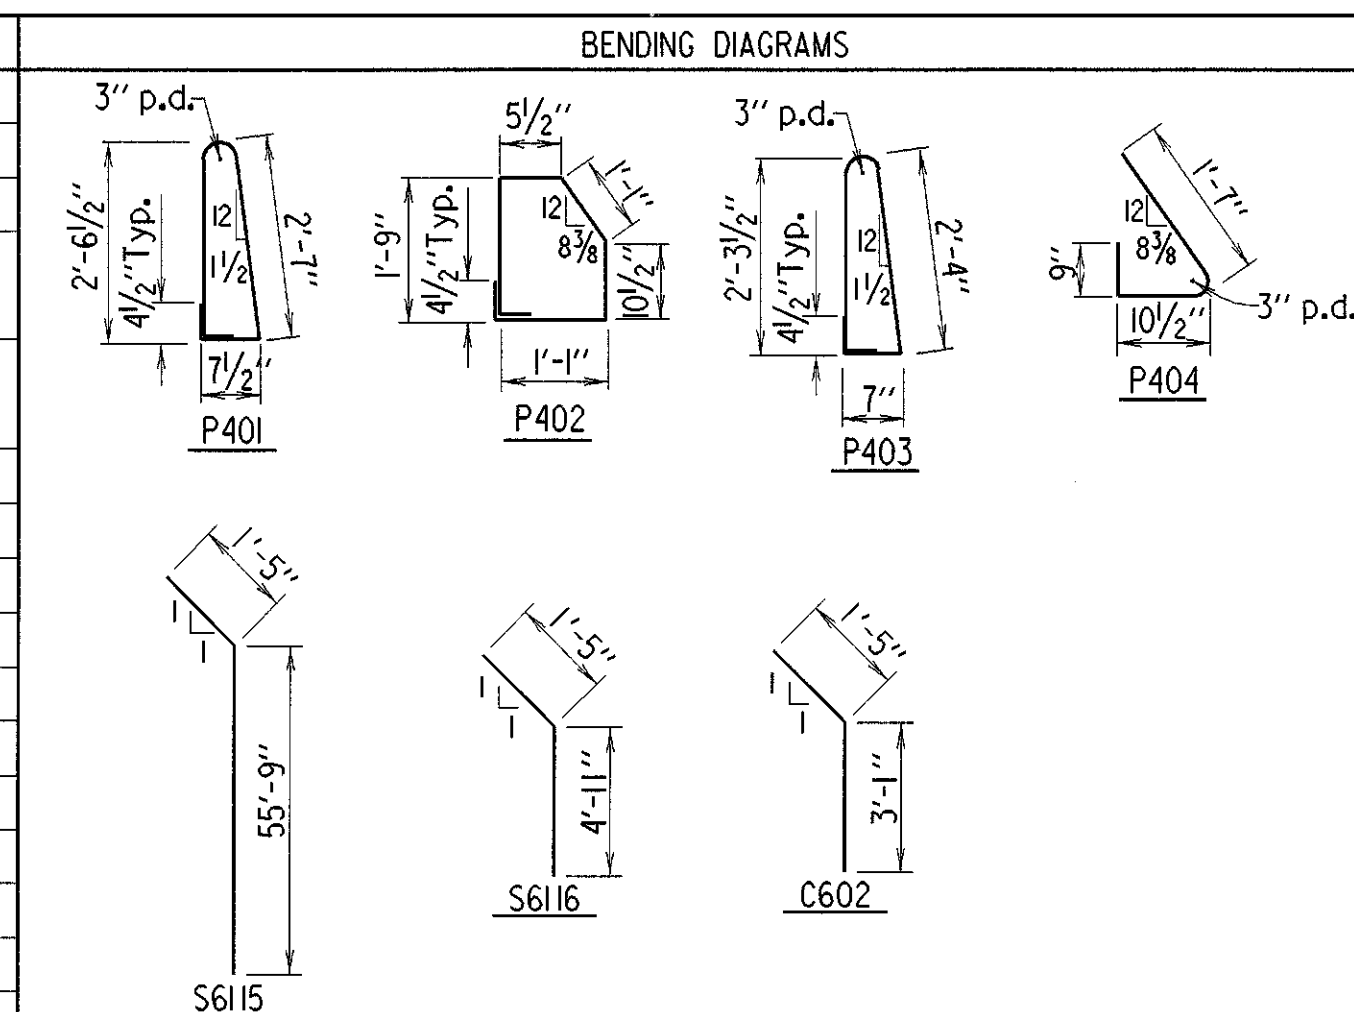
'-0 1/2" CLOSED PARA. PANEL
